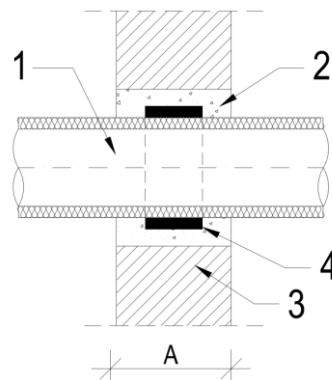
Pipe with insulation in flexible/rigid wall  $A \geq 125$  mm
